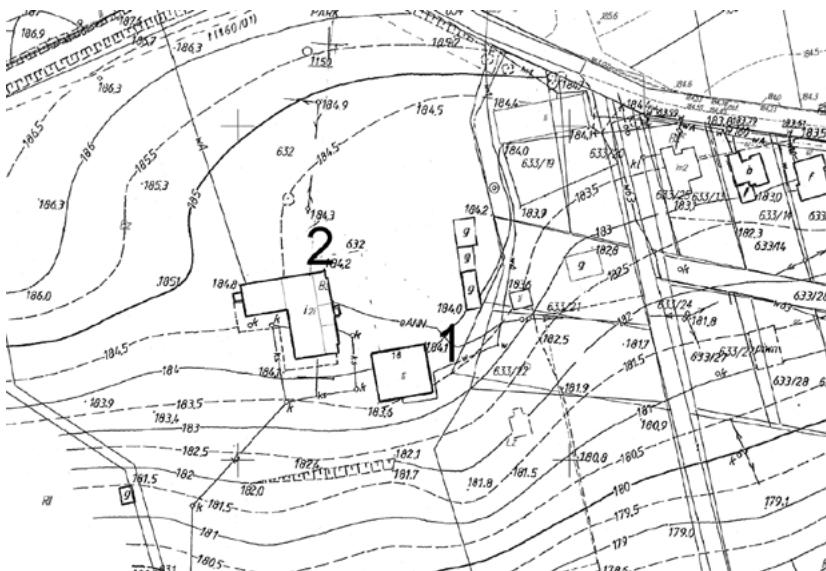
Situation map (1 – kitchen building – former manor house, 2 – current manor house building)
